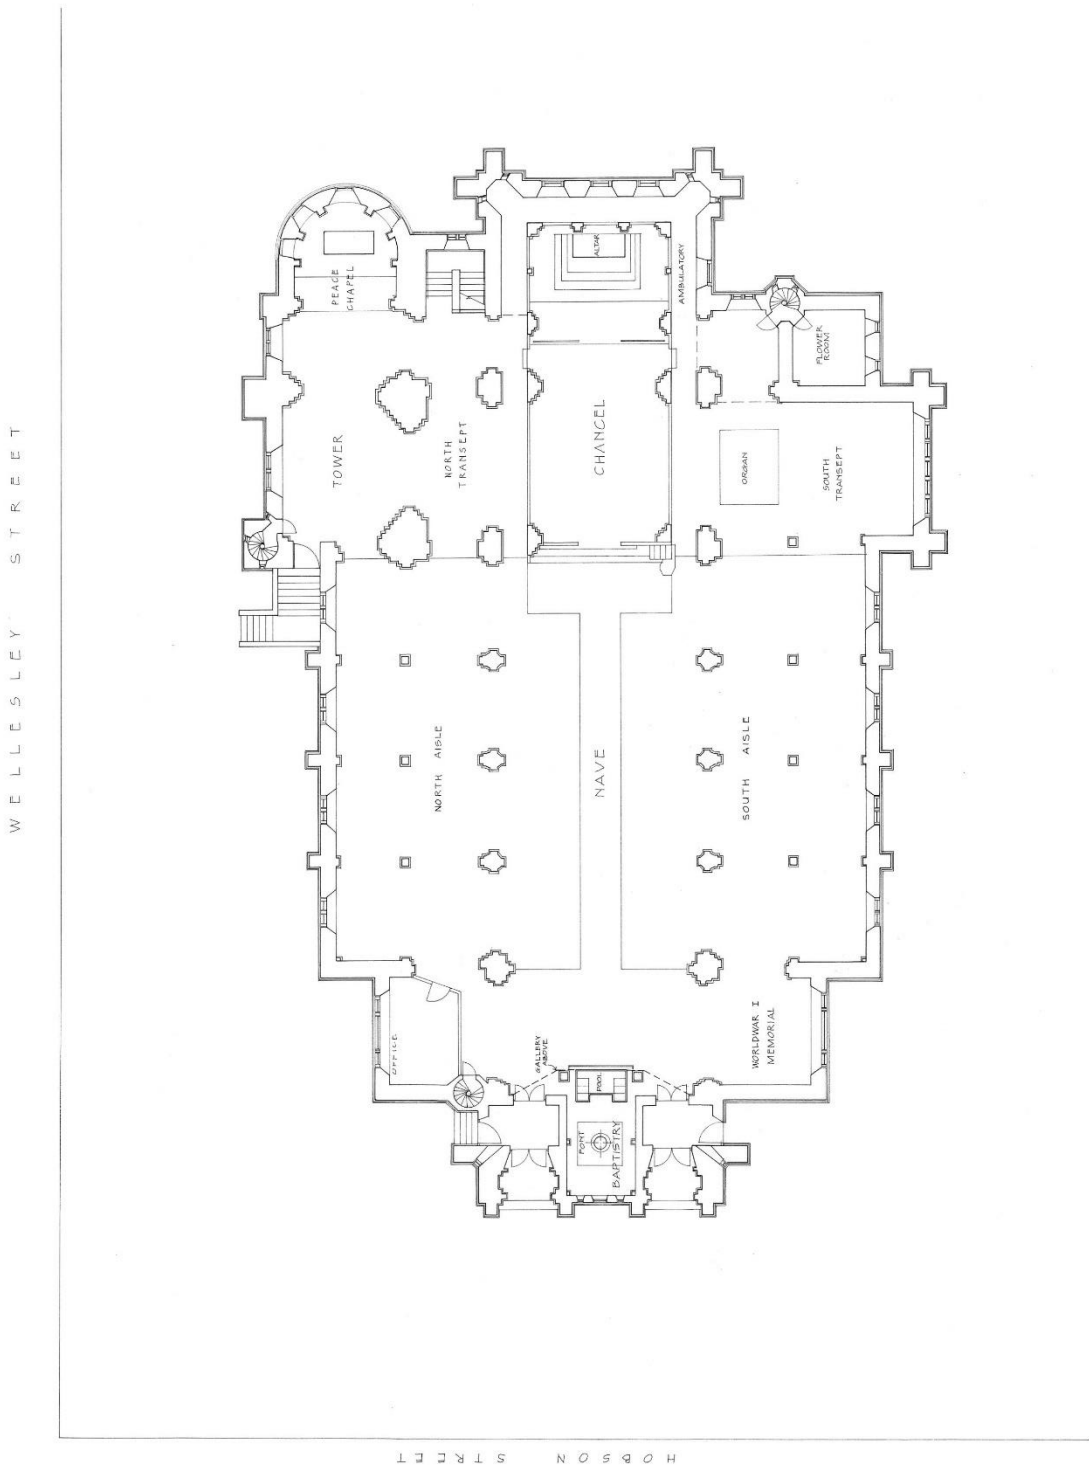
St Matthew-in-the-City – Ground Floor Plan
